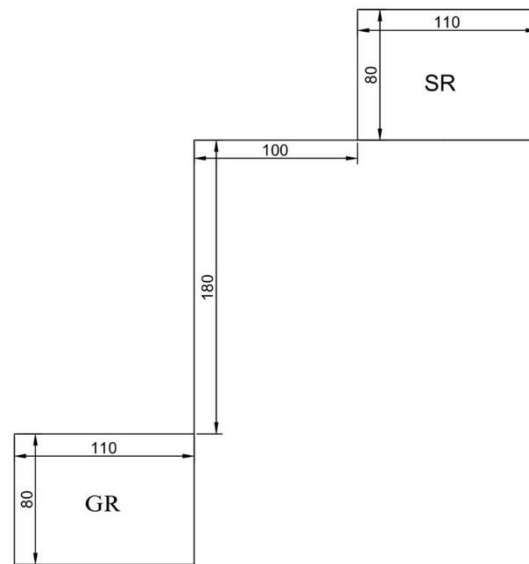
Green roof and Shingle roof's 2D schematic location. Dimensions in cm.
